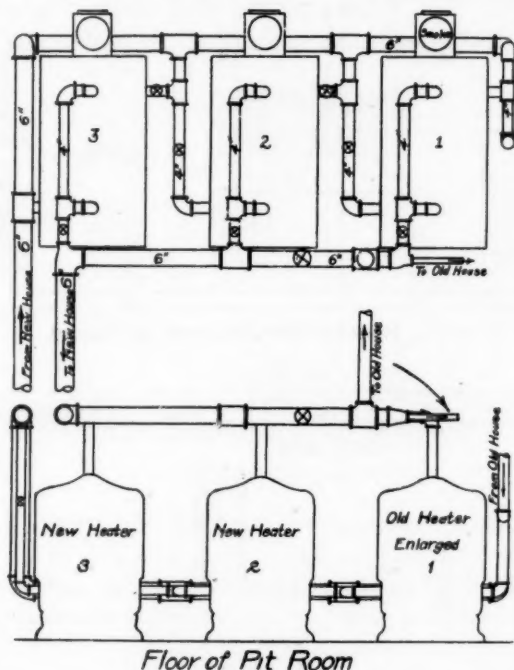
REVISED HEATER LAYOUT IN OLD CONSERVATORY.
